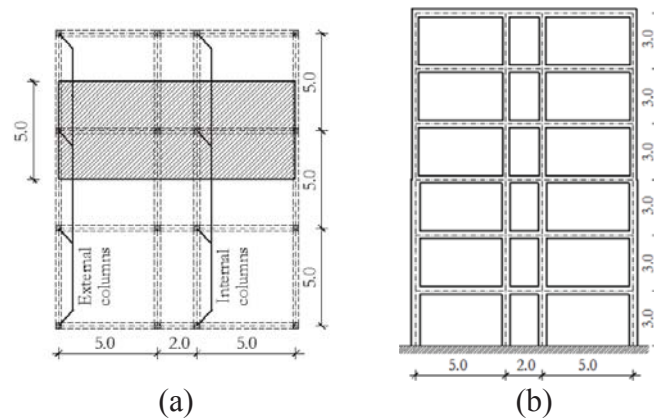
Geometry of the reference building: (a) plan view; (b) elevation view.
